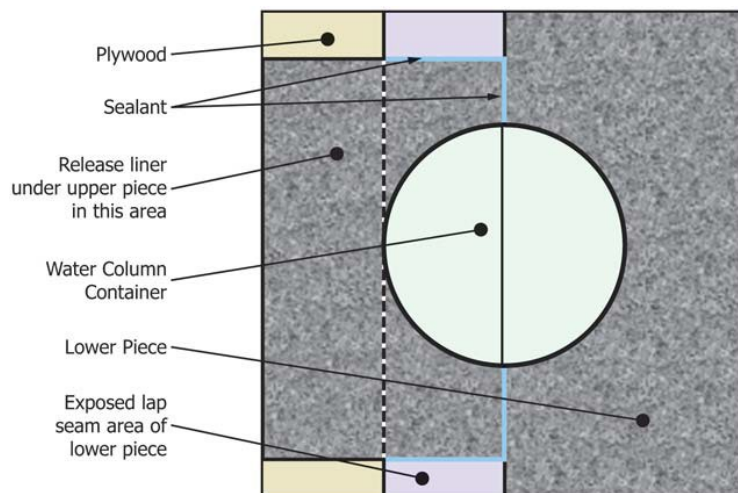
Waterproof Integrity of Side Lap Test Specimen Assembly
